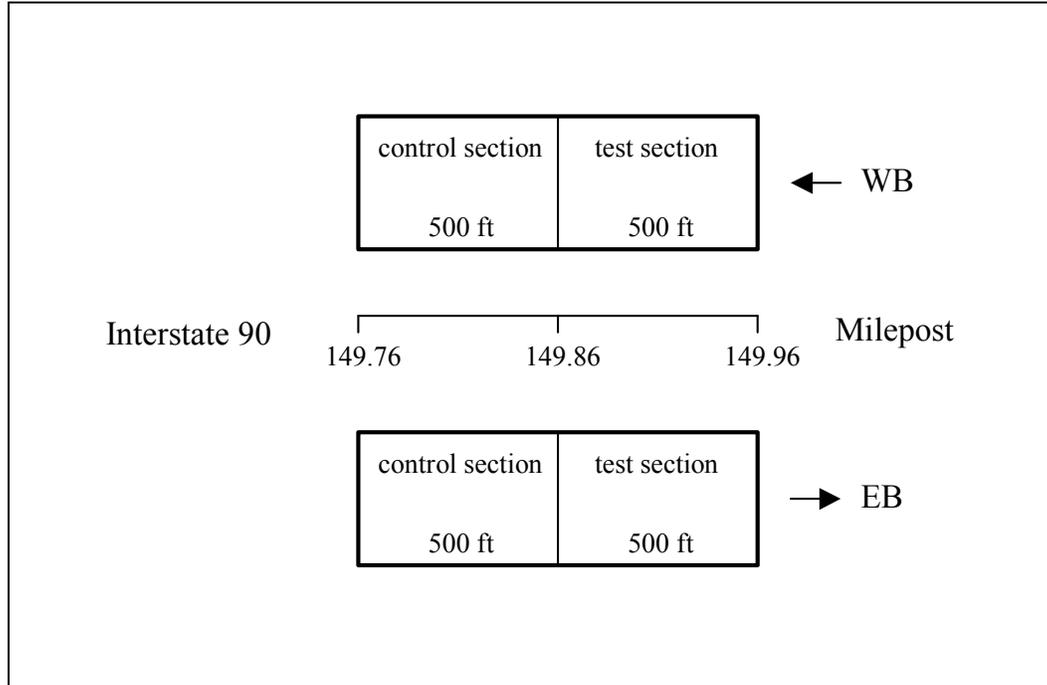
Layout of the Test Site at Bearmouth-Drummond
